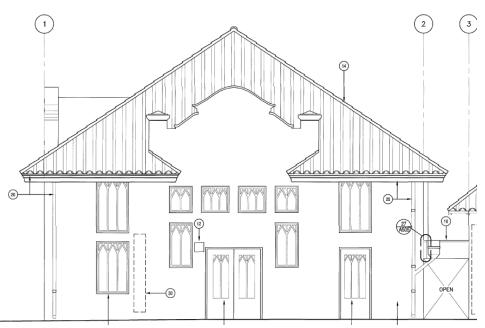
South elevation of the Old Bookstore. Source: Stanford University, 2007.
